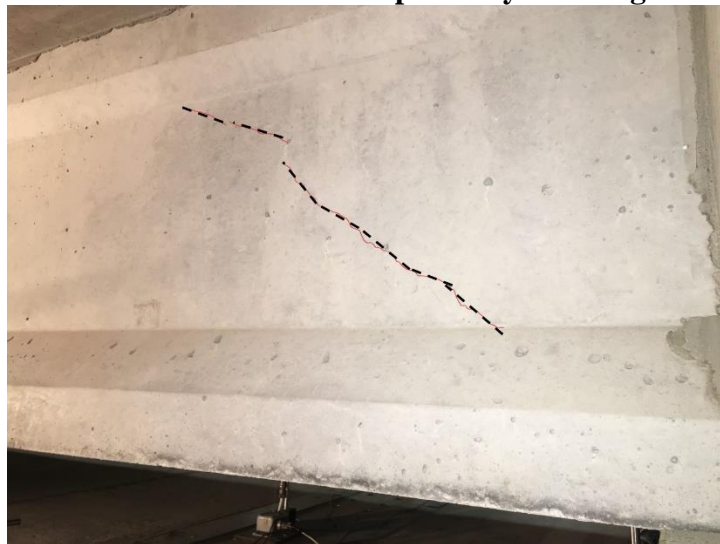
Initial shear crack in loaded girder (A5) outlined in red dashed lines
